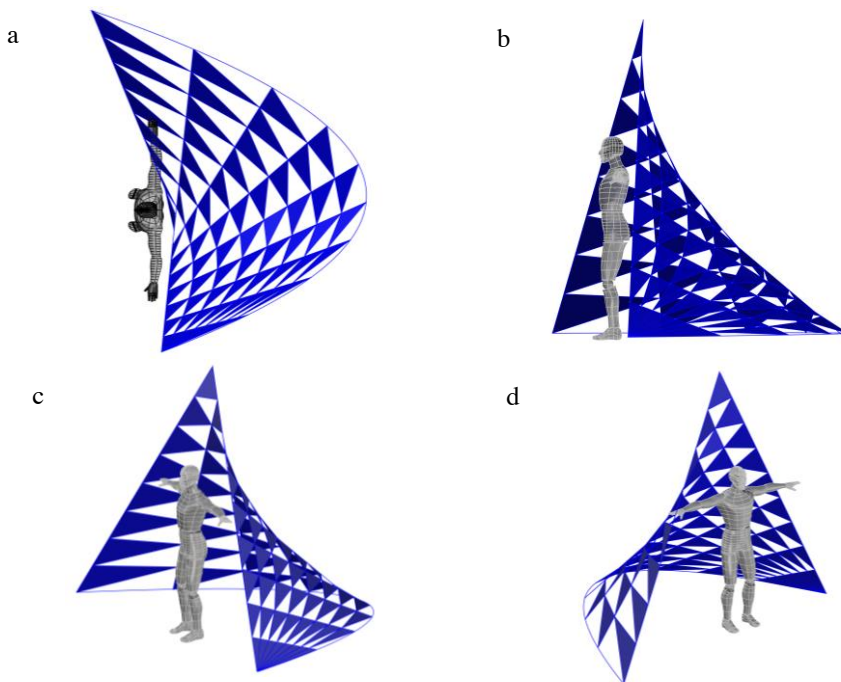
Plan view (a), and side elevation (b), and perspective views (c, d) of potential architectural form.
